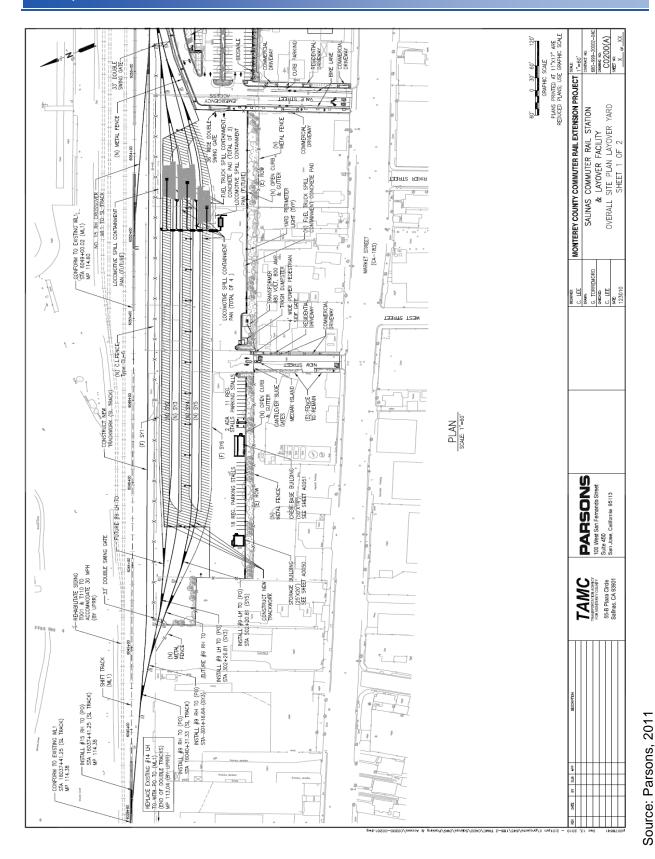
Salinas Layover Yard - Preliminary Design Layout
